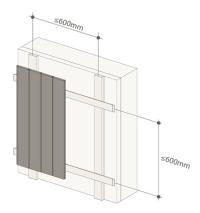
Single-layer thermo subframe for horizontal cladding installation
